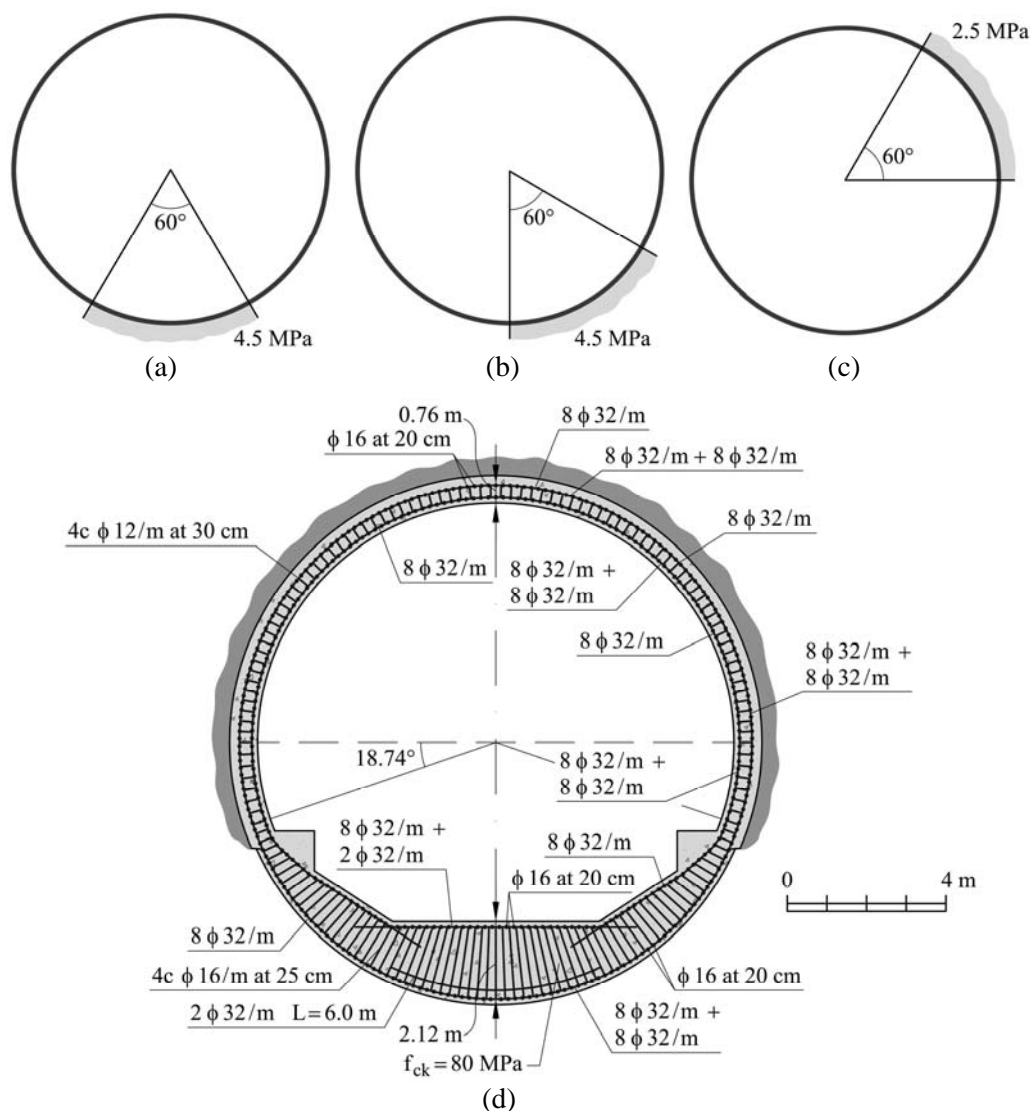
Details of the tunnel geometry and reinforcement: (a) – (c): design hypothesis (Marí & Pérez, 2003, with permission); (d) installed reinforcement (ADIF, 2006, with permission)
